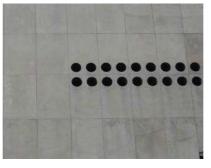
Facade of front pavilion of the building A with stains on "Veselje" slabs
